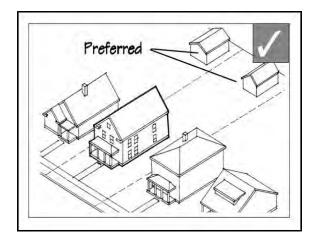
Indicates the preferred location of new secondary structures, which aligns with the build zone of existing secondary structures
